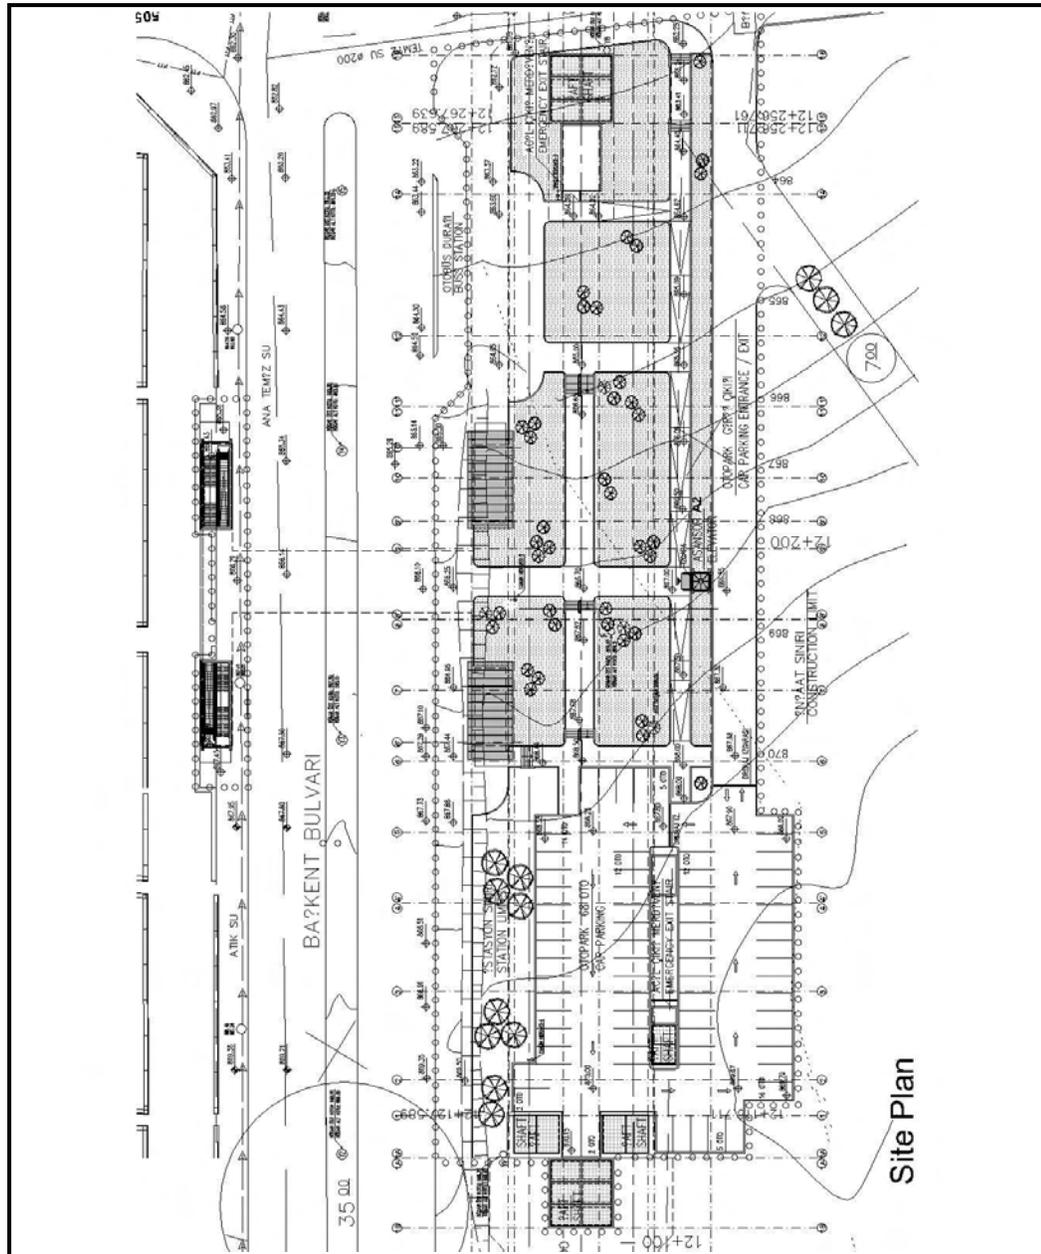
Site plan of Botanic station in third phase metro. (Tekfen Engineering CO., 2002)
